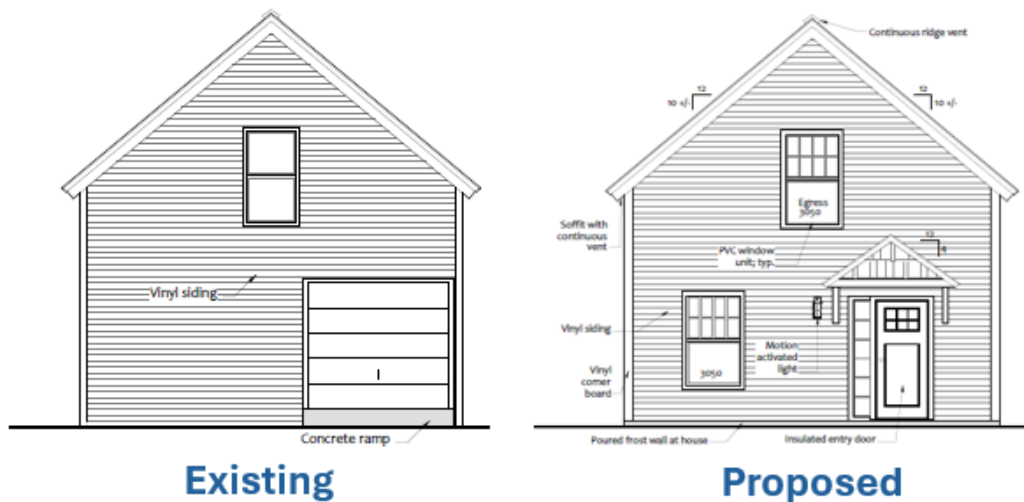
Snippets of the existing and proposed elevations for the north (main) façade of the barn being renovated.
